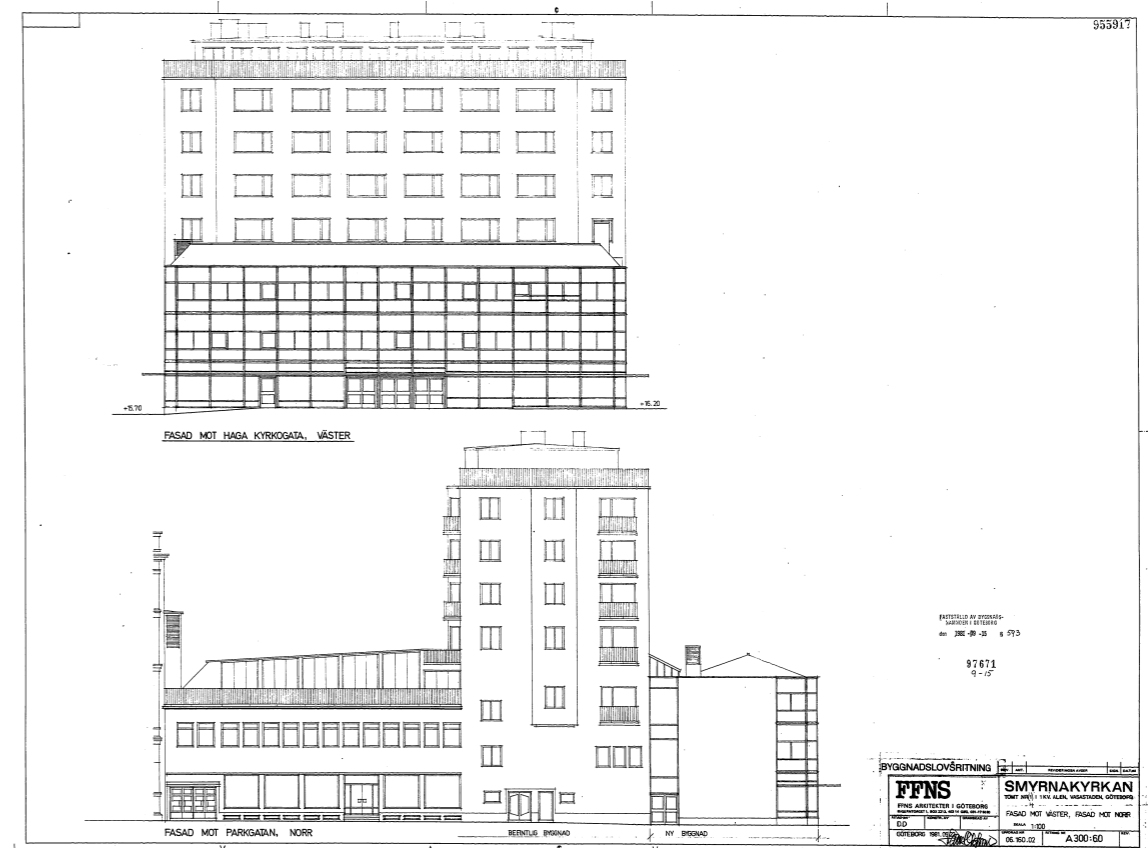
West and north elevation. Original drawing (1981) (Göteborgs Stad., n.d.)
